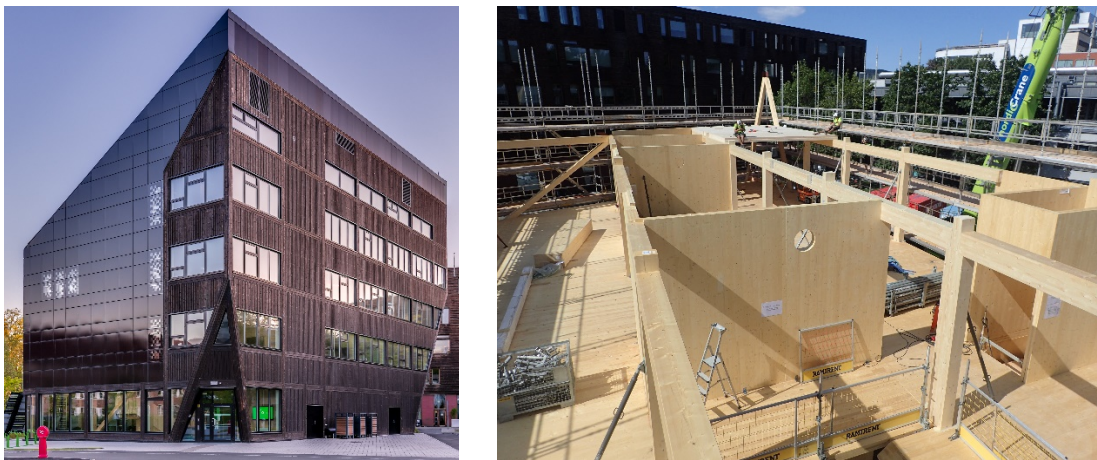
Left: the completed ZEB Laboratory (photo: Nicola Lolli, SINTEF). Right: the building under construction, showing the arrangement of glulam beams and columns and CLT shear wall elements and floor plates (photo: authors).
